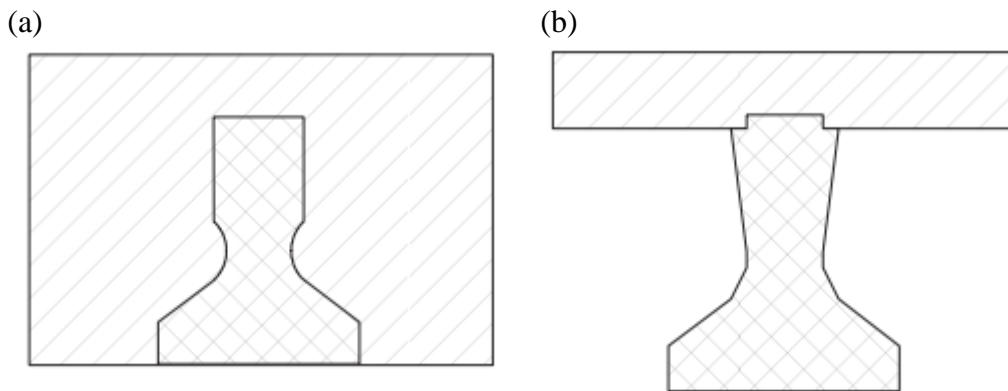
(a) T beam bridge; (b) Y and Super-Y beam bridge (Source: [4])
